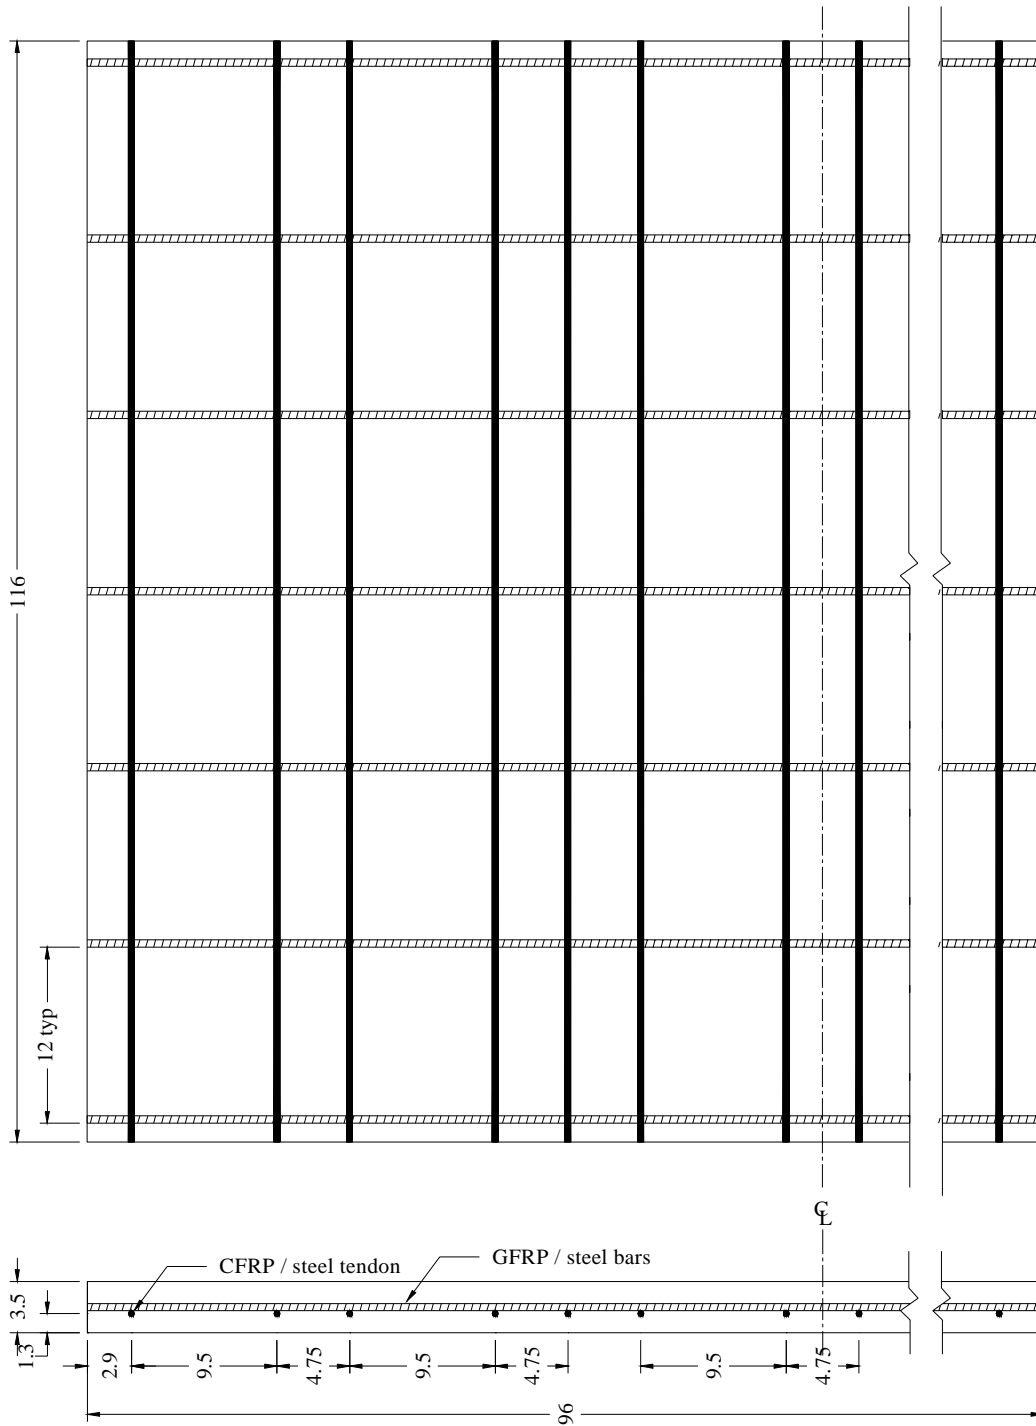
Cross-section and plan view of test panels (all values in inches)
